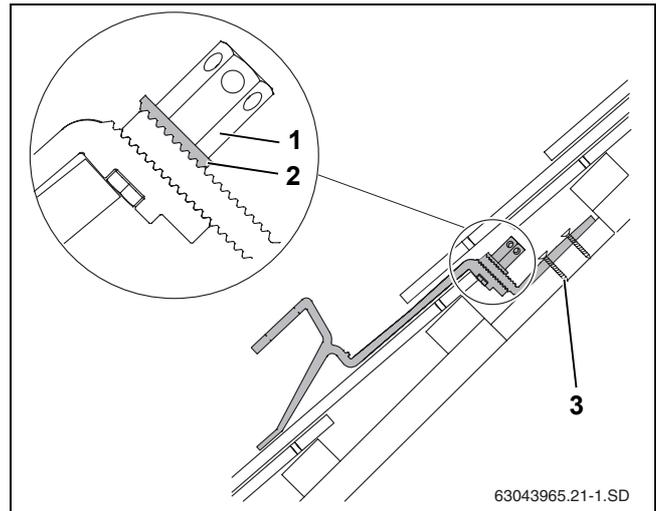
Assembled roof hook. View of section with trimmed lower part of roof hook
